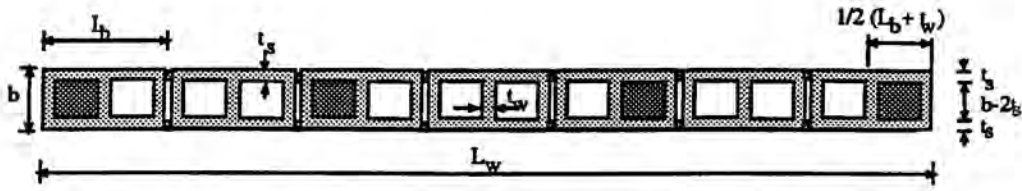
a Typical Cross-Section of Partially Grouted Shear Walls
